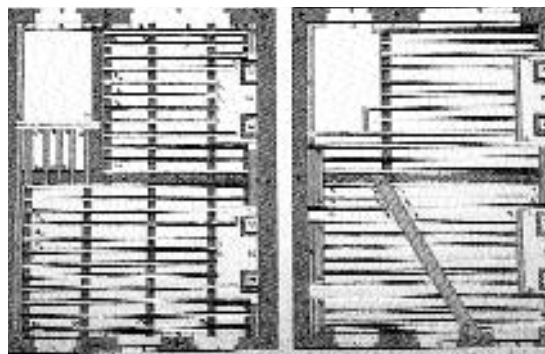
Timber floor construction from Peter Nicholson, *The New and Improved Practical Builder and Workman's Companion*, 1823
